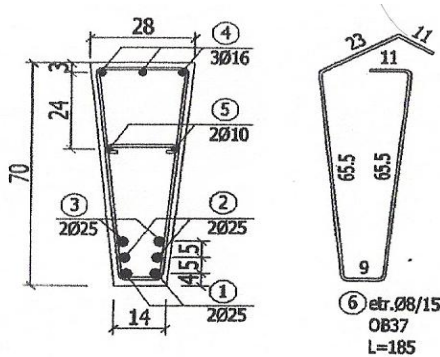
b.- Cross section of the roof beam – inferior zone (2)-
